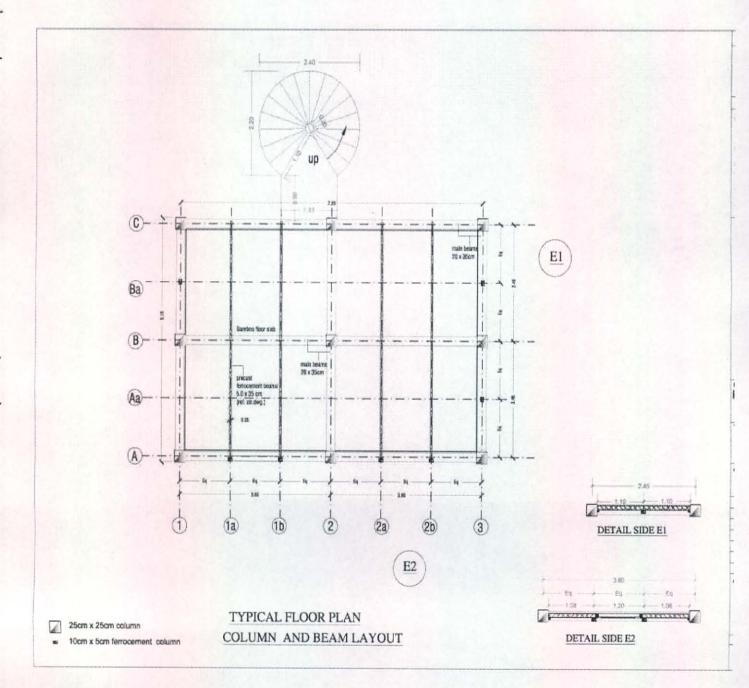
Floor plan and column and beam layout of the bamboo house.
